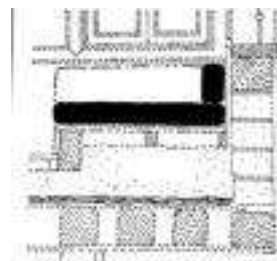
Cantilever detail of winter room (Kucukerman, 1996)
